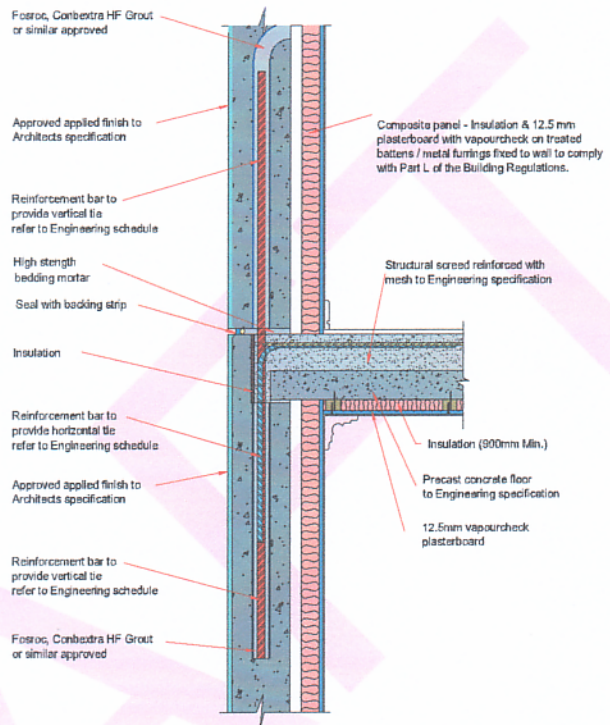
Typical Detail at Upper Floor Level Perimeter Wall
